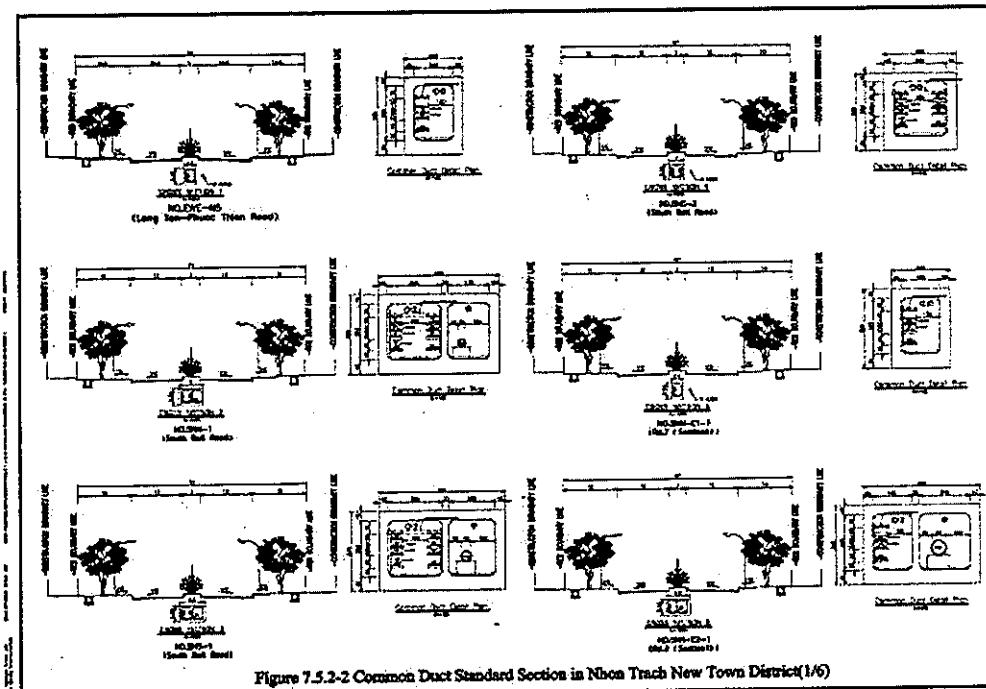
Common Duct Standard Section in Nhơn Trạch New Town District(1/6)
